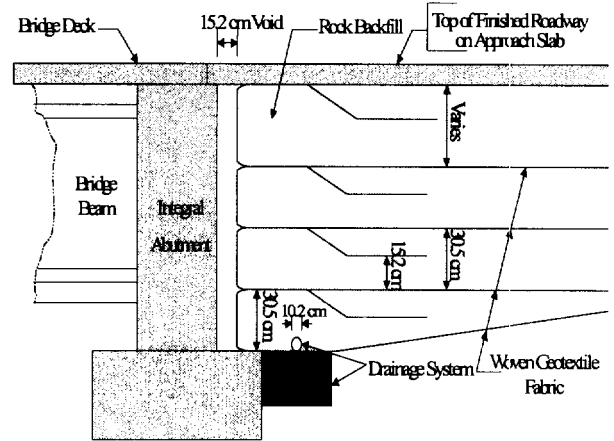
Typical geotextile reinforced soil wall behind the bridge abutment.
